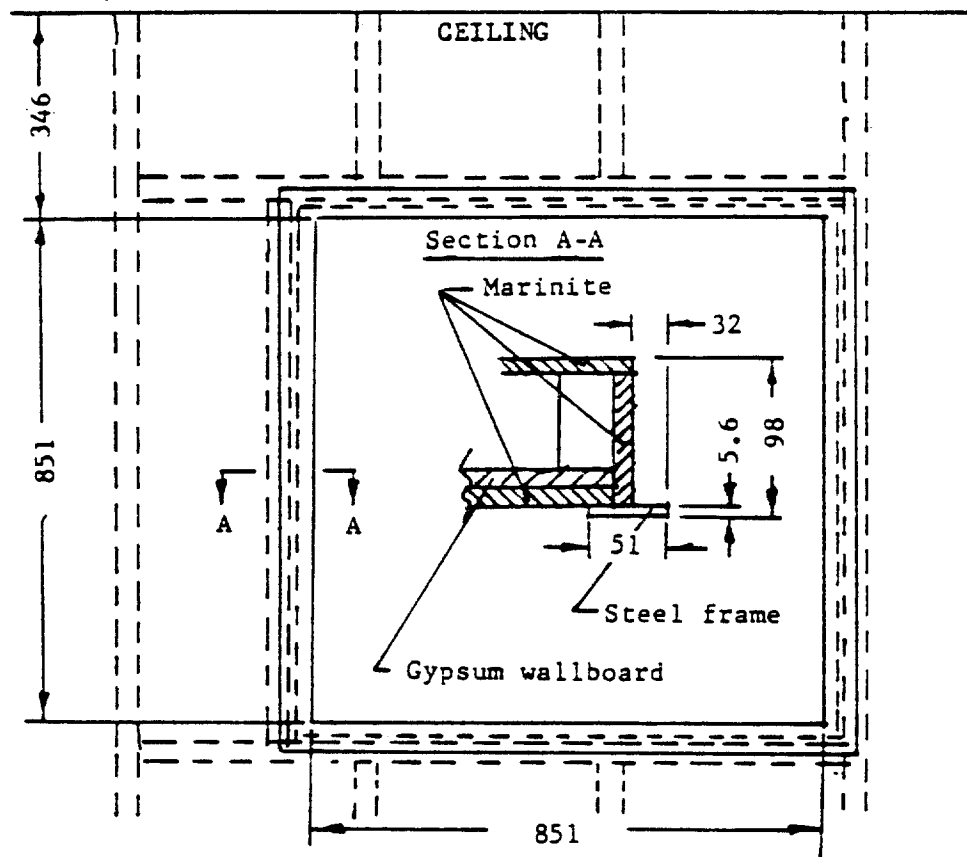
Window in burn room viewed from inside (dimensions in mm)
